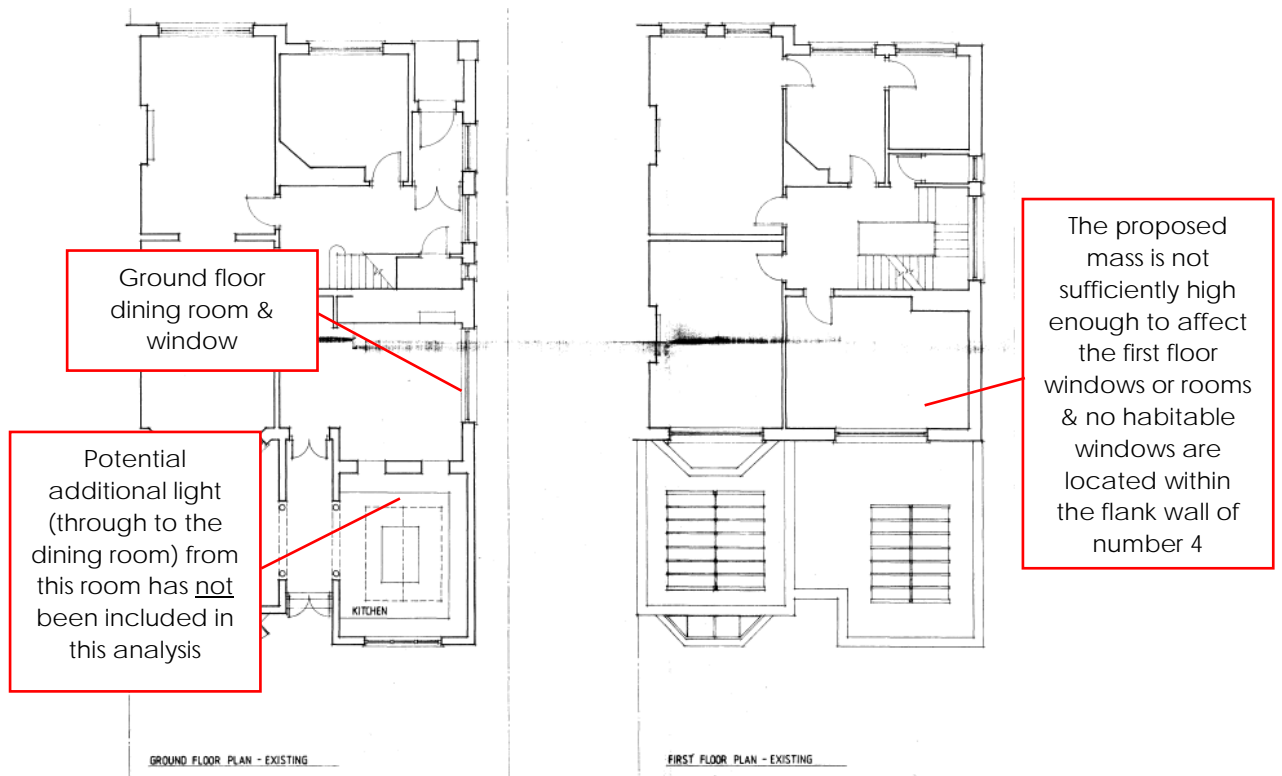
Layout of 4 Akenside Road (from planning archive)
